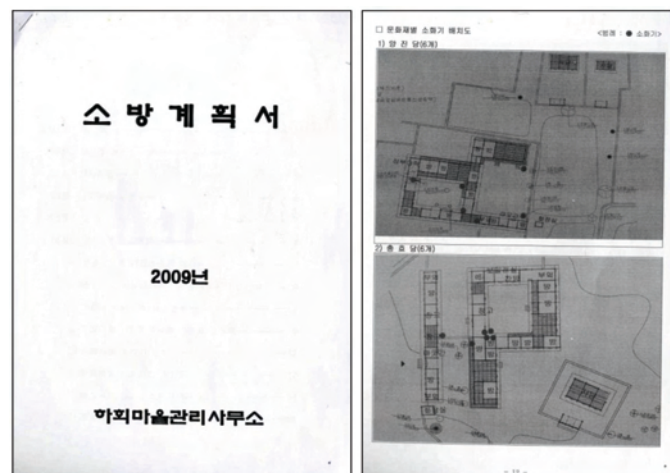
Firefighting Plan by the Hahoe Village Management Office
